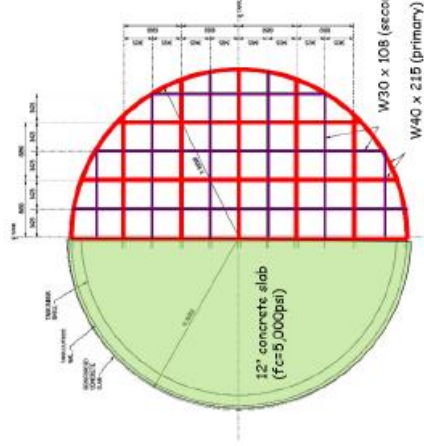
408 m³ 99%N₂ Steel Single Containment Modular LNG Tank General Arrangement
